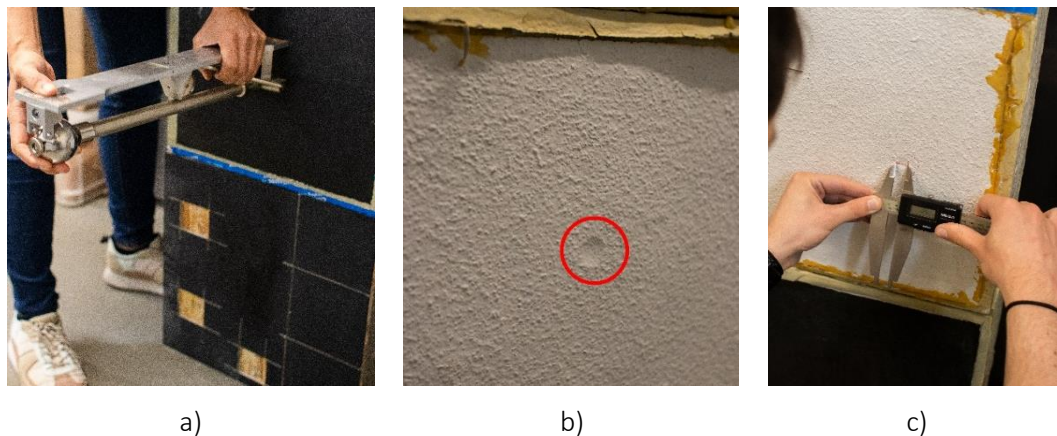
a) Hard body impact test; b) Example of dent identification; c) Dent diameter measurement.
